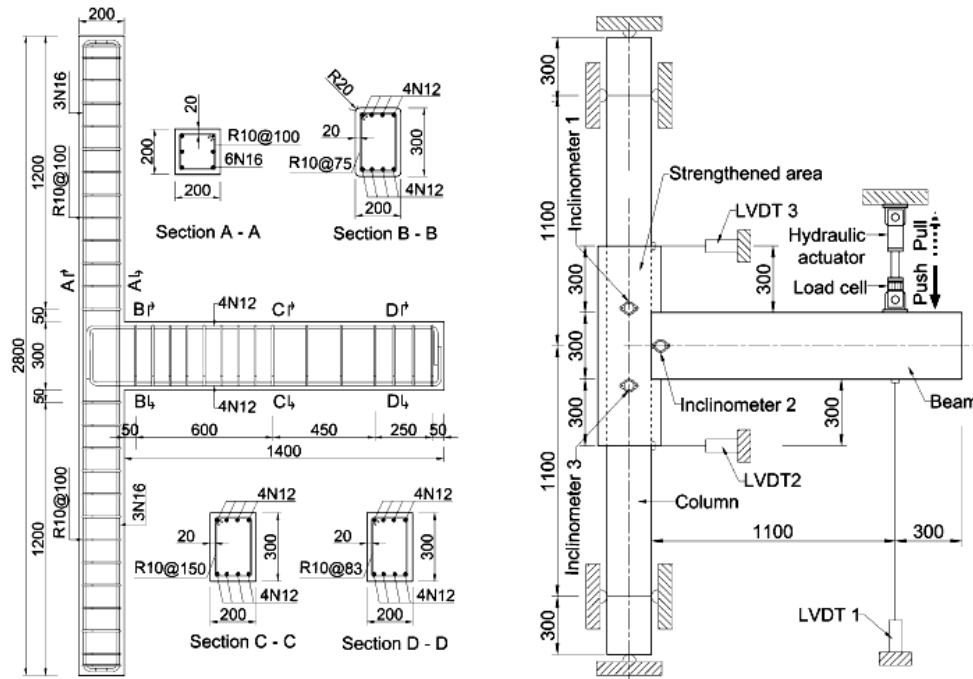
Reinforcement detailing and Schematic diagram for testing setup (Hadi and Tran, 2015)
